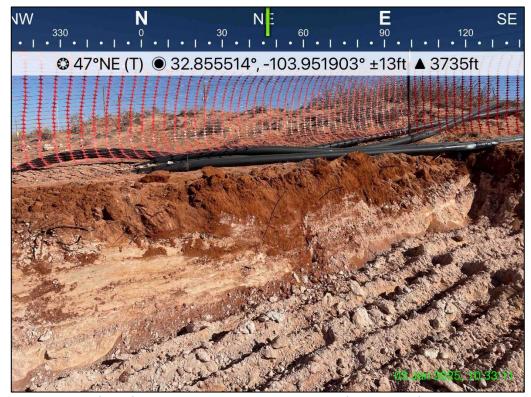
~1 foot of topsoil observed in northeast corner of excavation, facing northeast
